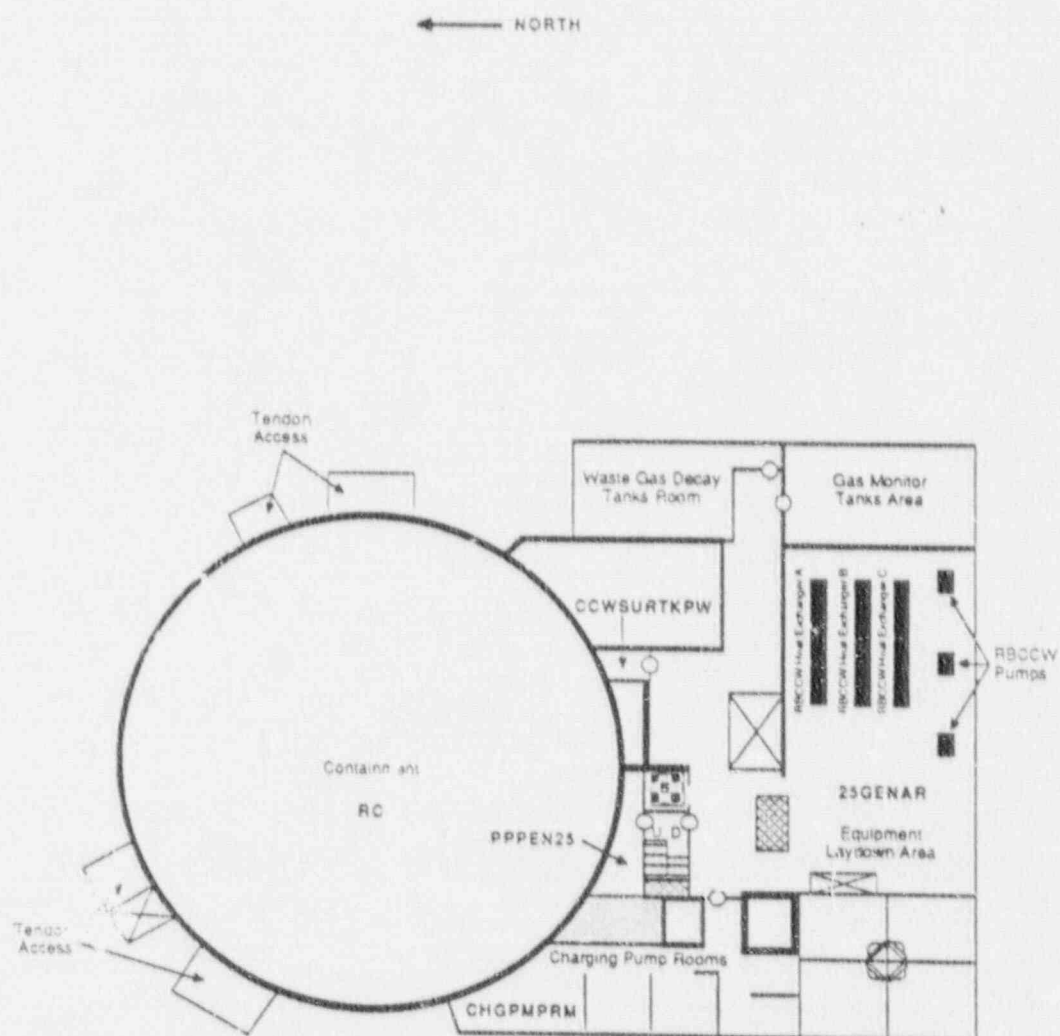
Millstone 2 Containment and Auxiliary Buildings, Elevation -25' 6"
